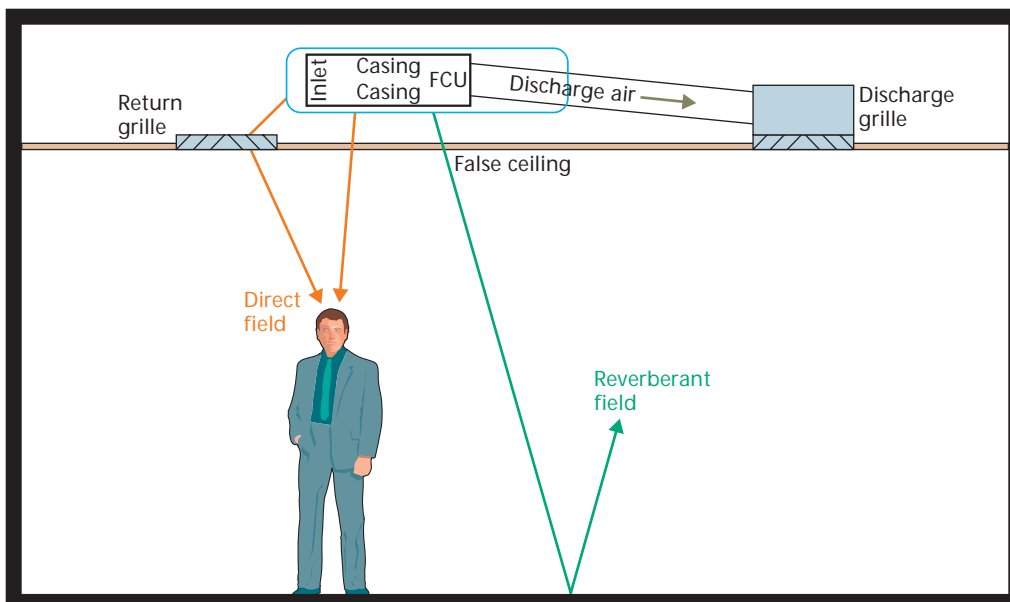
Room correction approach for ceiling void installations (not to scale)
